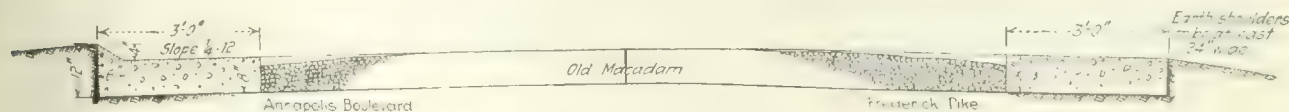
TYPICAL SECTIONS OF WIDENED MACADAM ROADS
